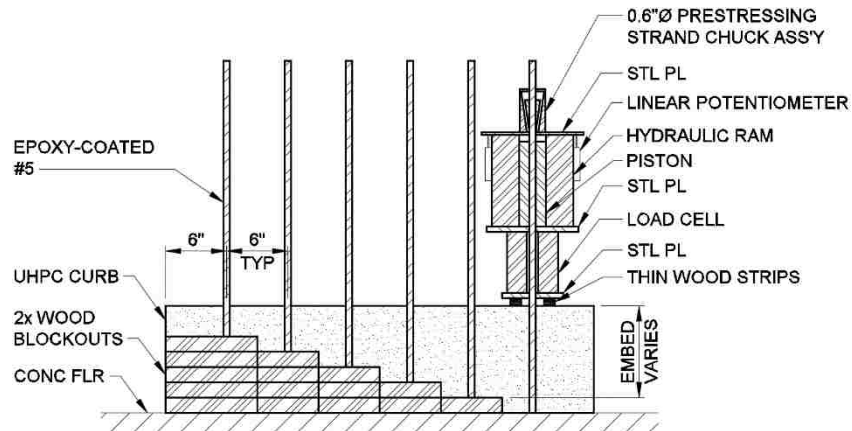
Longitudinal section view of a pullout curb with testing apparatus shown on one specimen.
